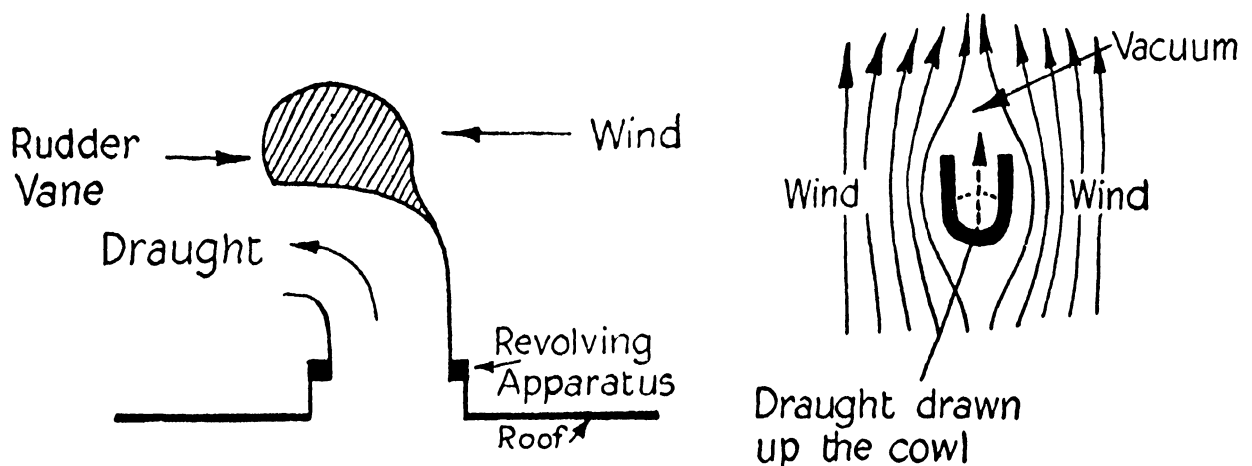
COWL VENTILATOR, SHOWING VACUUM CAUSING UPWARD DRAUGHT
